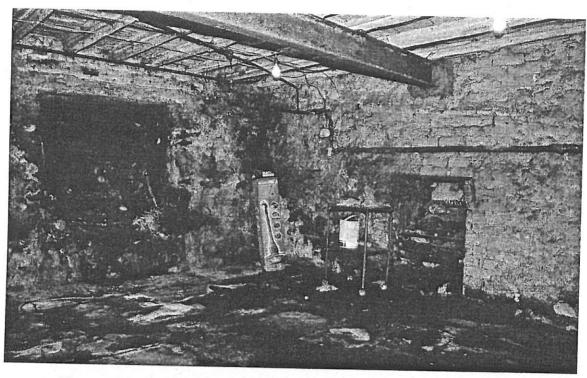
Front room in cellar, towards light well and fireplace in west wall
